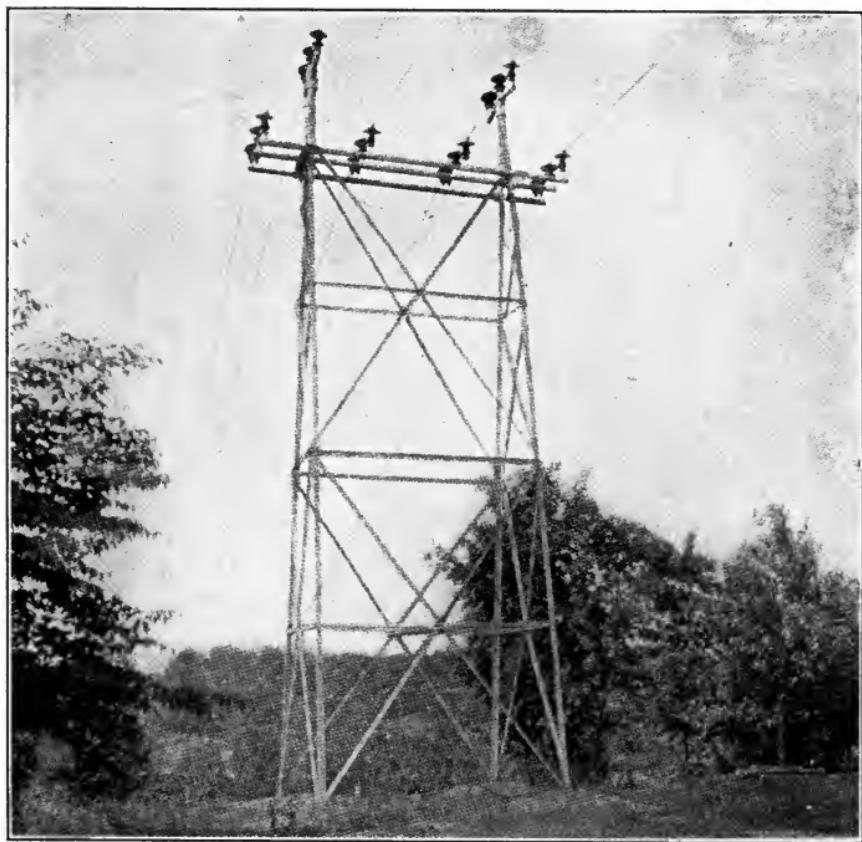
Type of Steel Tower Used in Niagara Falls—Montreal Transmission
